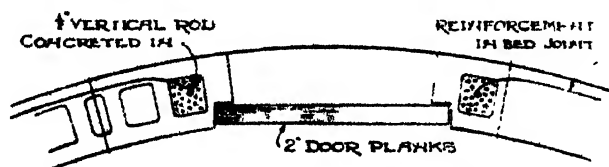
Detail Plan of Door of Concrete Block Silo.
